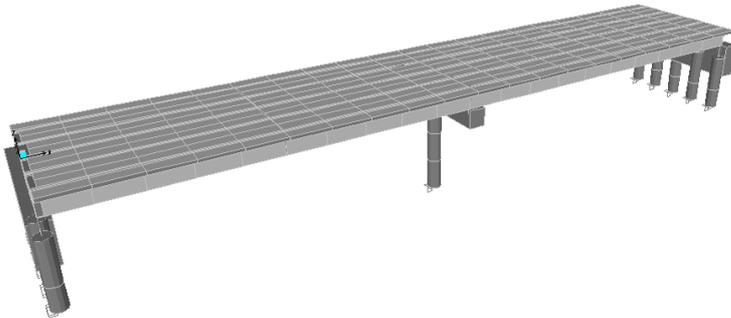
Two spans integral abutment bridge model developed using SAP 2000.
